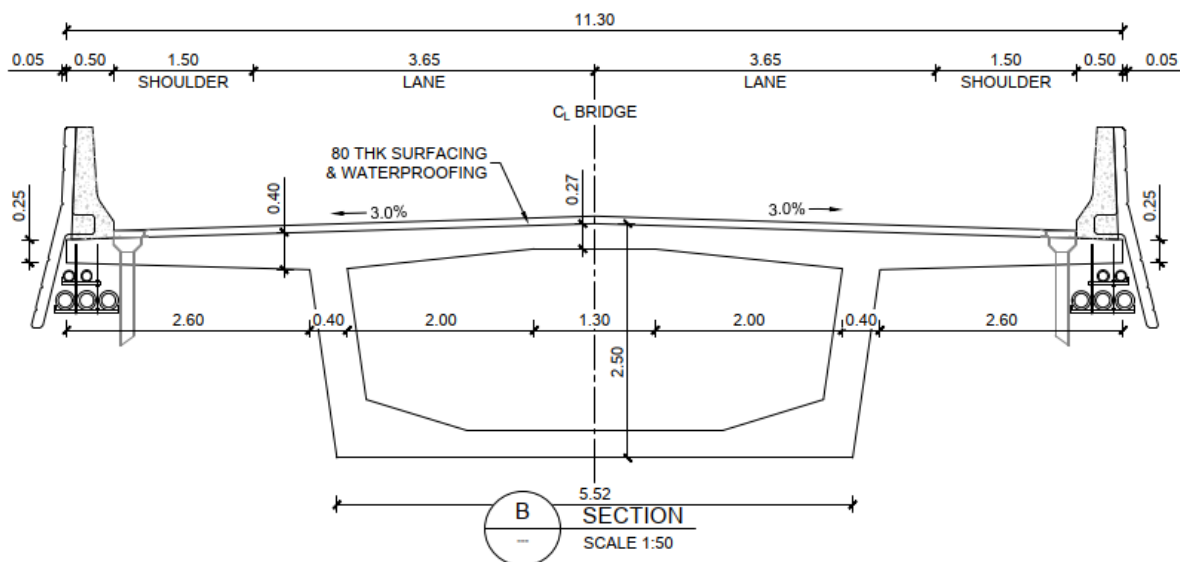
Typical cross section for Balanced Cantilever spans in the midspan (Main span) for Netrokona-Sunamganj
